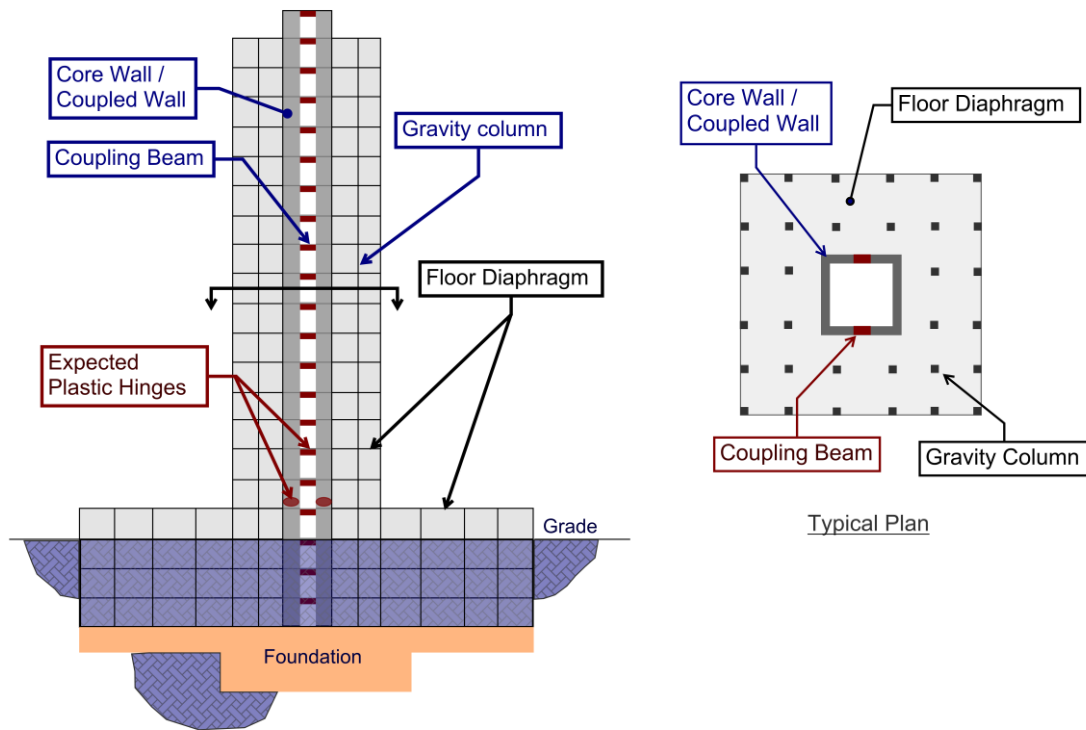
Elevation View of a Typical Coupled Core Wall Building.
